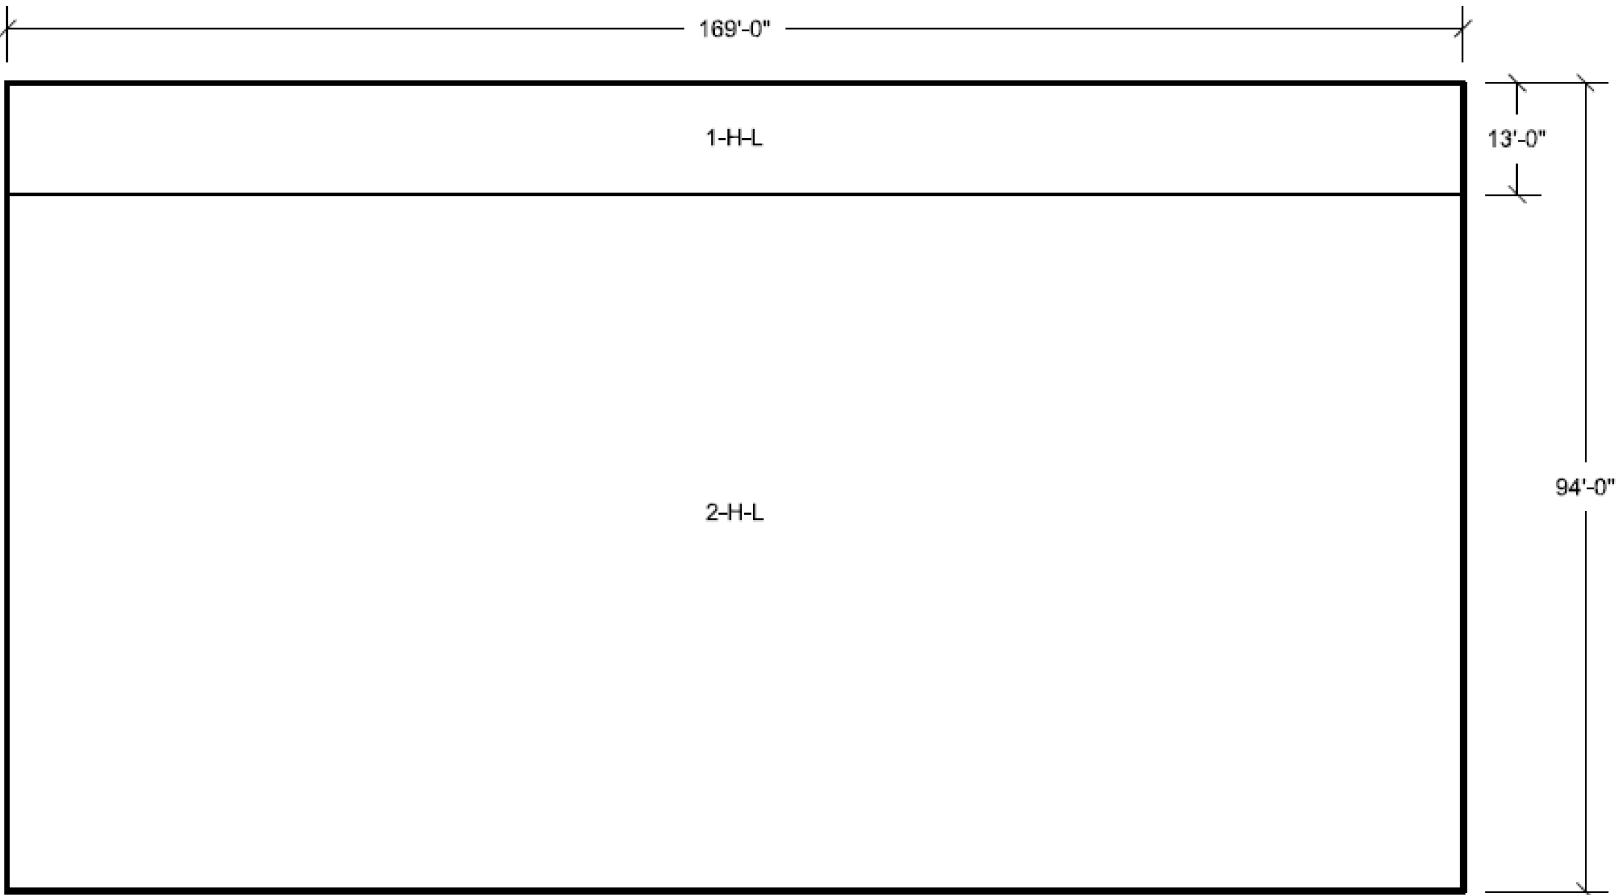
H.6-123 Pump House Foundation Mat East/West Reinforcement Zones Top Face
